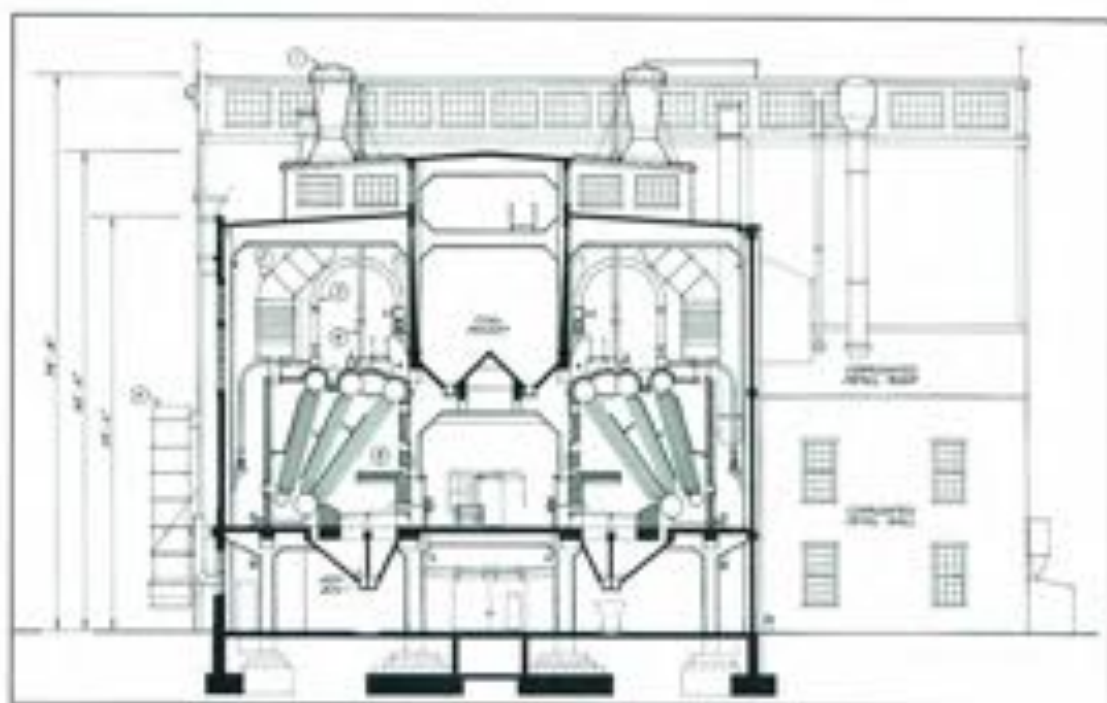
Building Section (Per Historical American Engineering Record, Heritage Conservation & Recreation Service, Barry A. Richards & Yoshitako Koyama, 1962)
